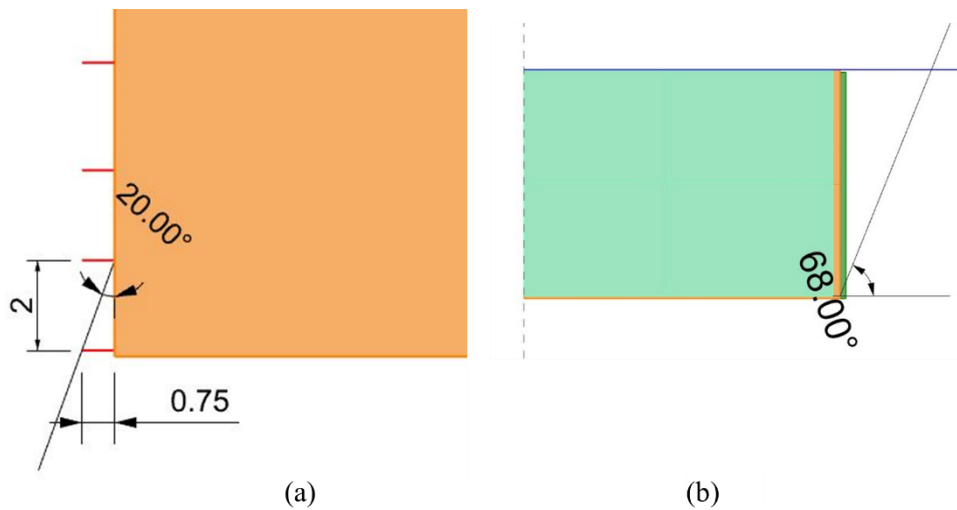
Shading calculations of the ground floor for the west facade from the plan view (a) and south facade from the section view (b)
